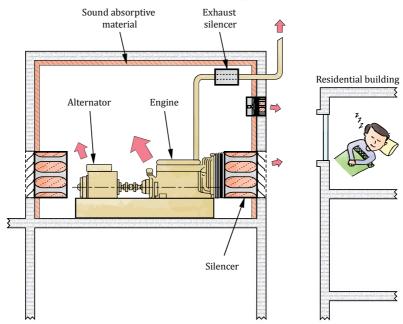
Noise Insulation of Emergency Generator Set Plant Rooms
